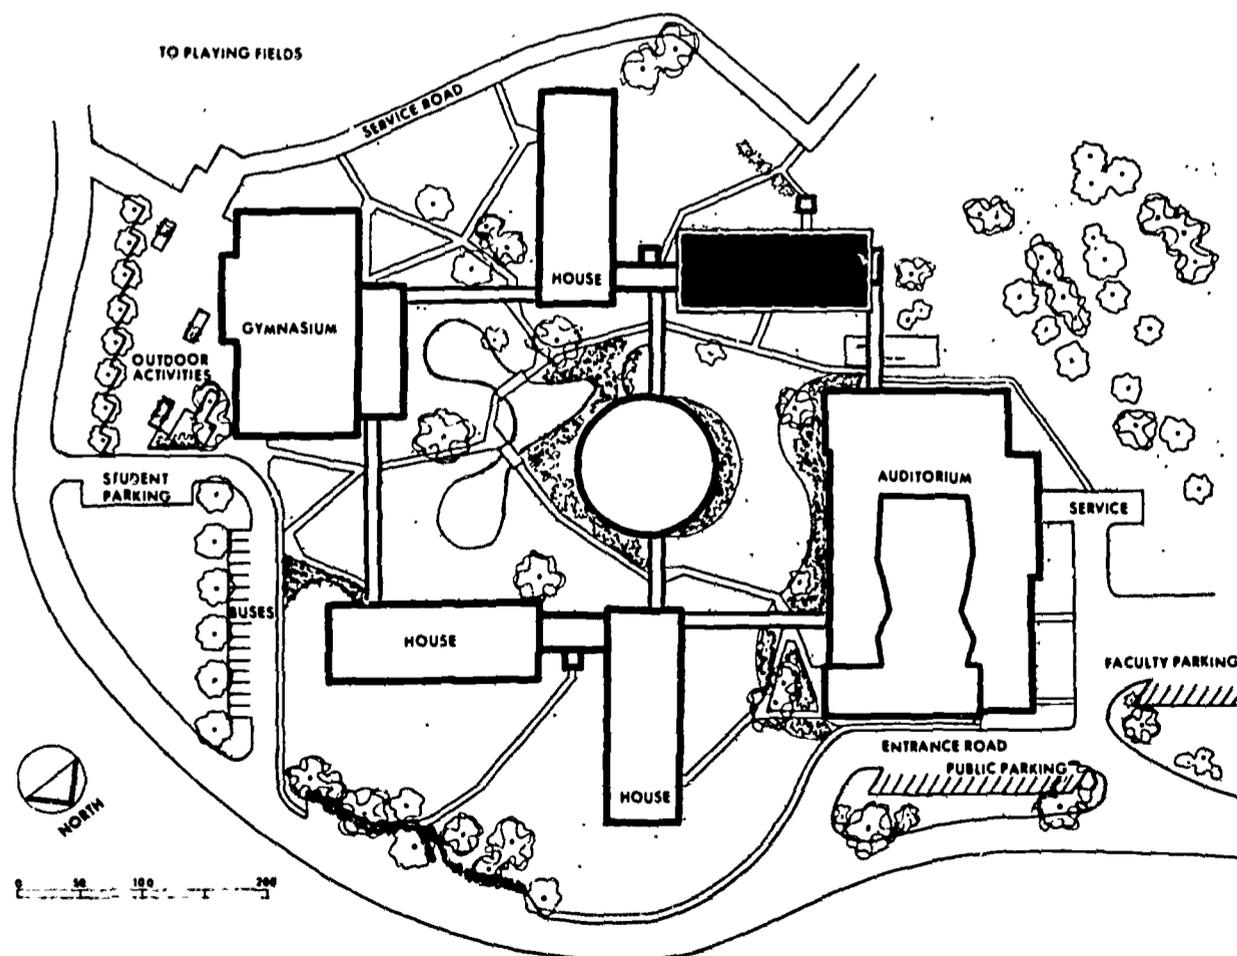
“House” plan of Newton (Massachusetts) South High School. Second-floor plan, above right.
